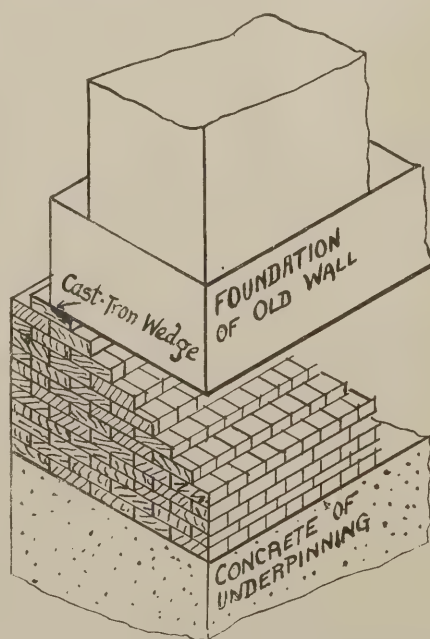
STEPPING OF BRICKWORK ON TOP OF CONCRETE.
